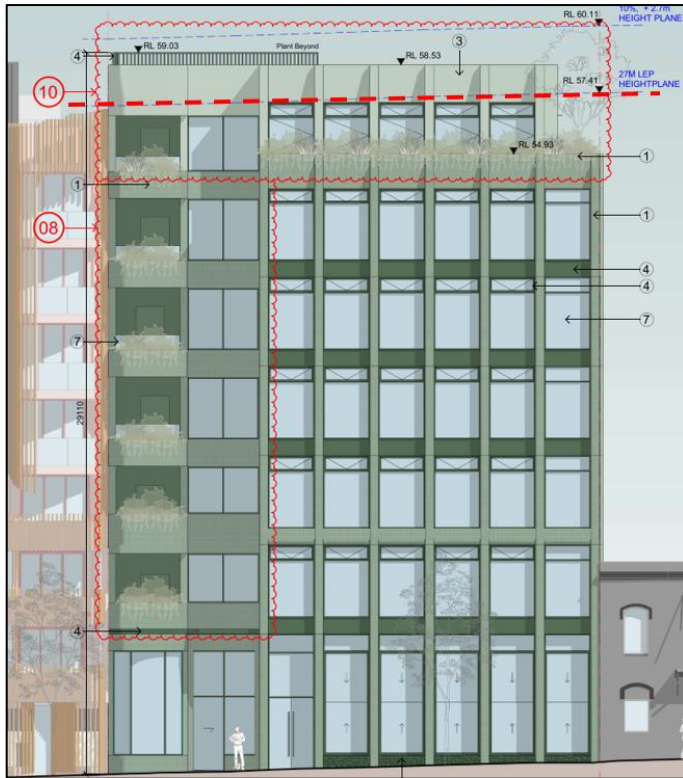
Cooper Street elevation of the approved commercial building under D/2023/904 showing the 27m height control in red dash
